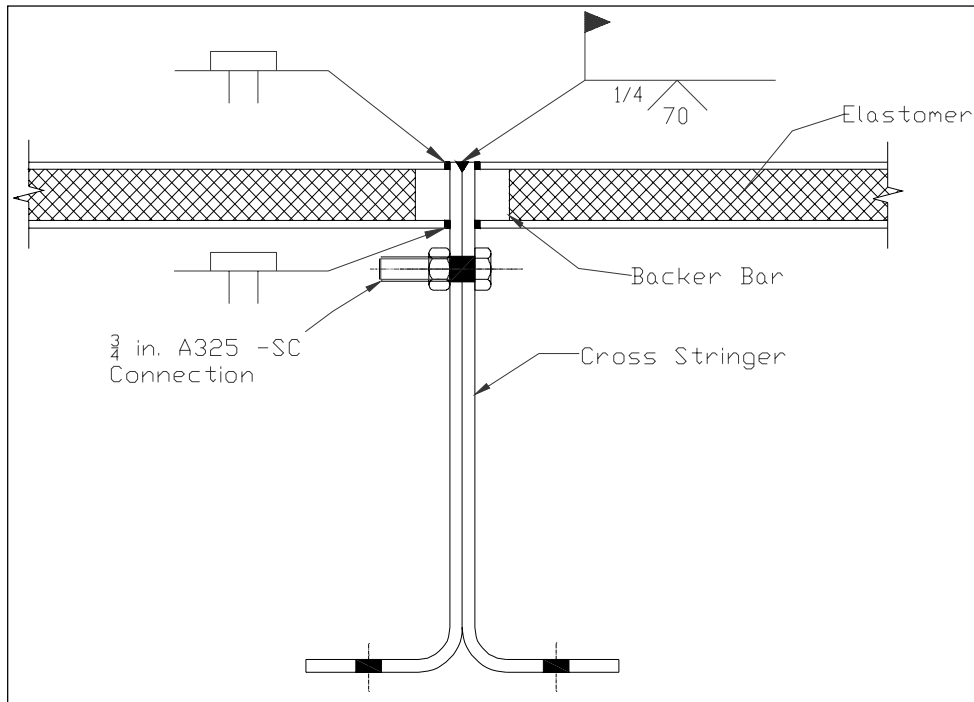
CONNECTION BETWEEN TWO SANDWICH PANELS
